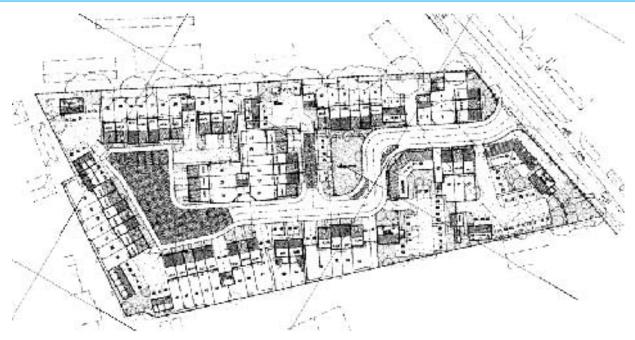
Plan of Colchester avenue by Bovis Homes Ltd
